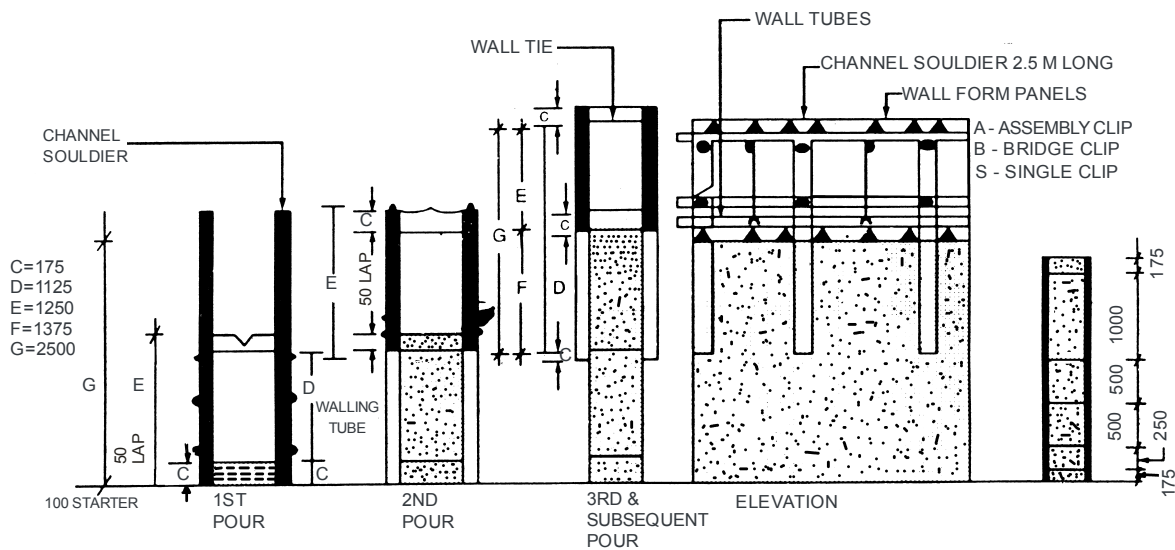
A : Wall Tie for Two Sided Shuttering
